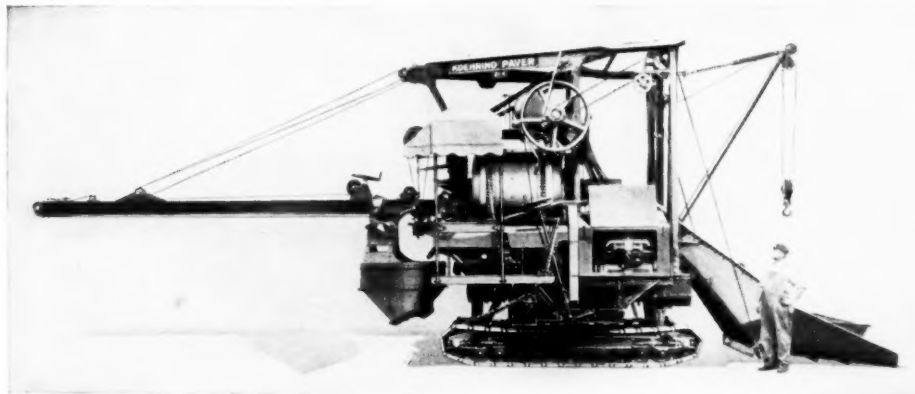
A Concrete Mixer used for paving work, showing details of operation and construction. *Courtesy of Kochring Company
